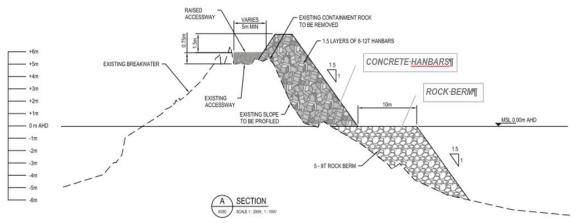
Typical Section of Proposed Upgrade (Option 8)
